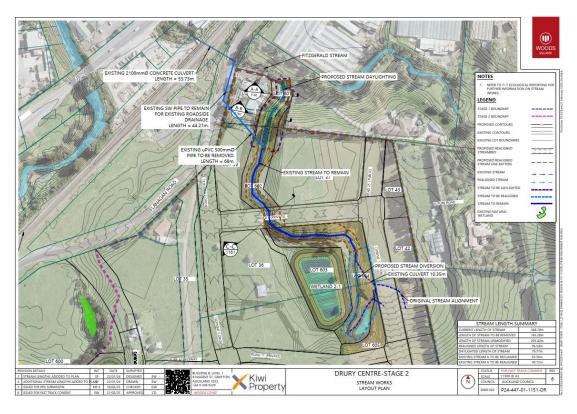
Proposed streamworks layout plan for Stream A (Source: Woods Fast Track Consent Plan Set).
